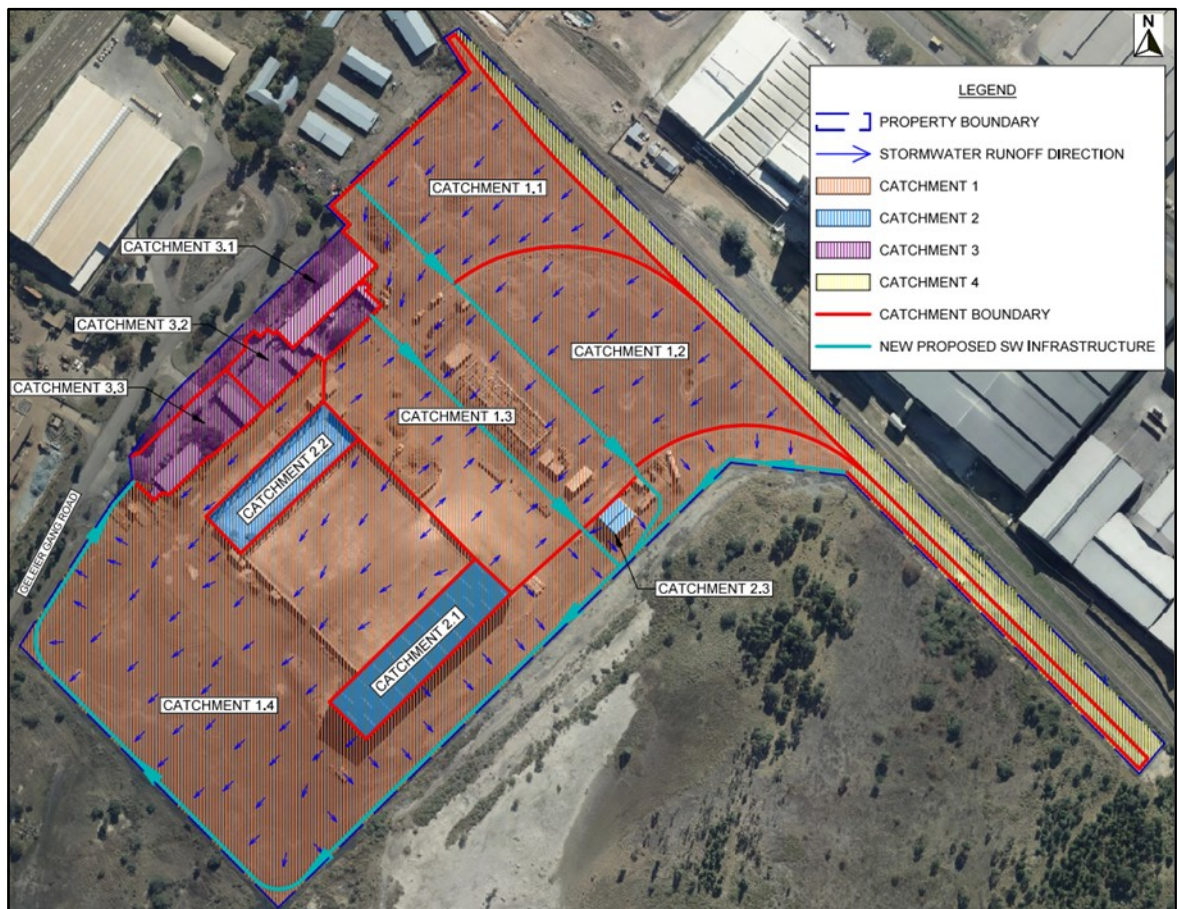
Proposed positioning of new stormwater infrastructure to serve catchment 1
